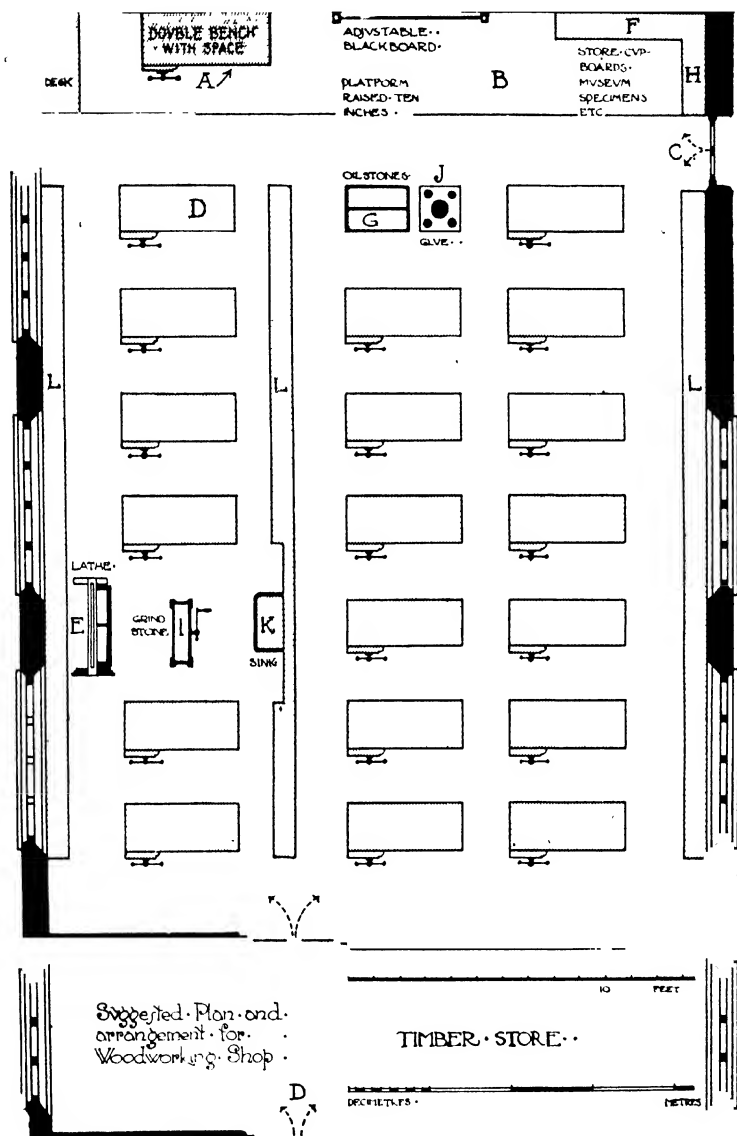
Suggested arrangement of workshop for handcraft and technical classes.
